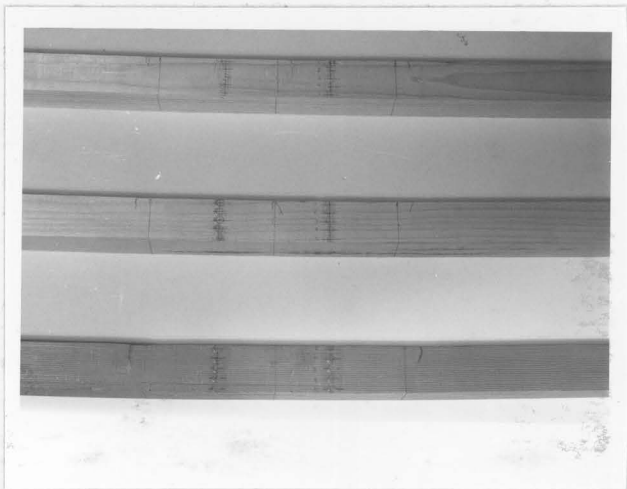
TYPICAL FAILURE IN 1.50 x 1.65 INCHES CLEAR BEAM
